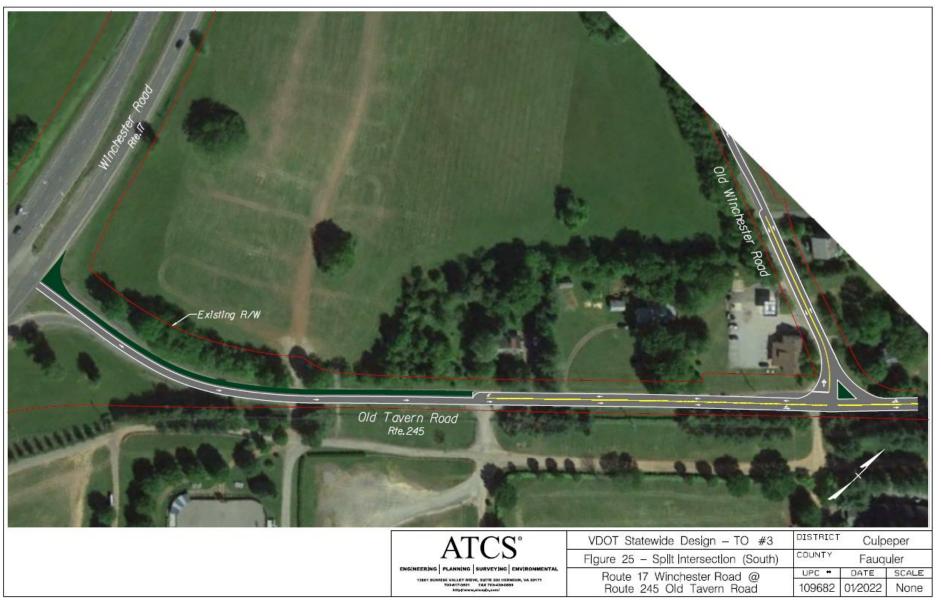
Split Intersection Alternative Concept Sketch – Southern Details
